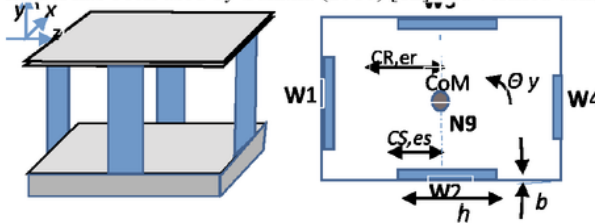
(a) Simple 3-D building model (b) on-plan view of shear wall elements
